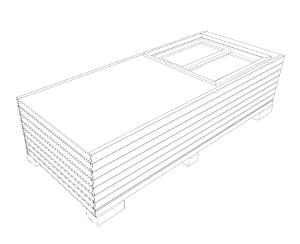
Stack the wall panels one above the other, stack shall be elevated from ground on angle sections, to prevent moisture sepage
